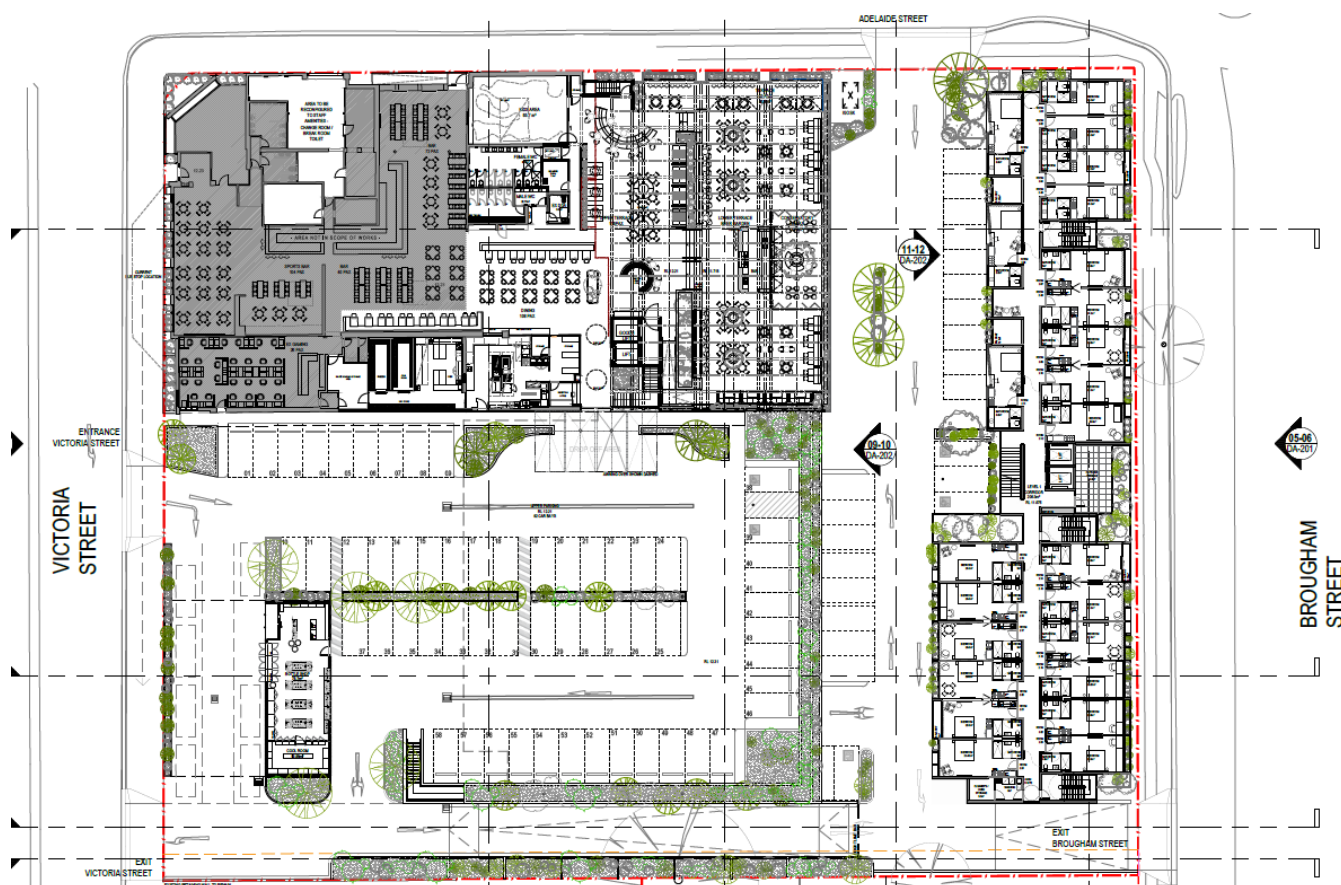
Upper Ground Floor Plan (Source: Loop Creative, 2024)
